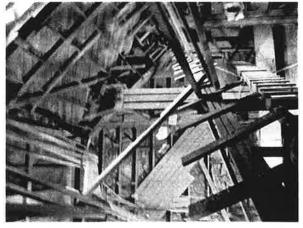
The dome is a cavernous space full of rigged ladders, gangplanks, and bits and pieces of past construction work. Access to the roof is through various hatches around the base and top of the dome.
